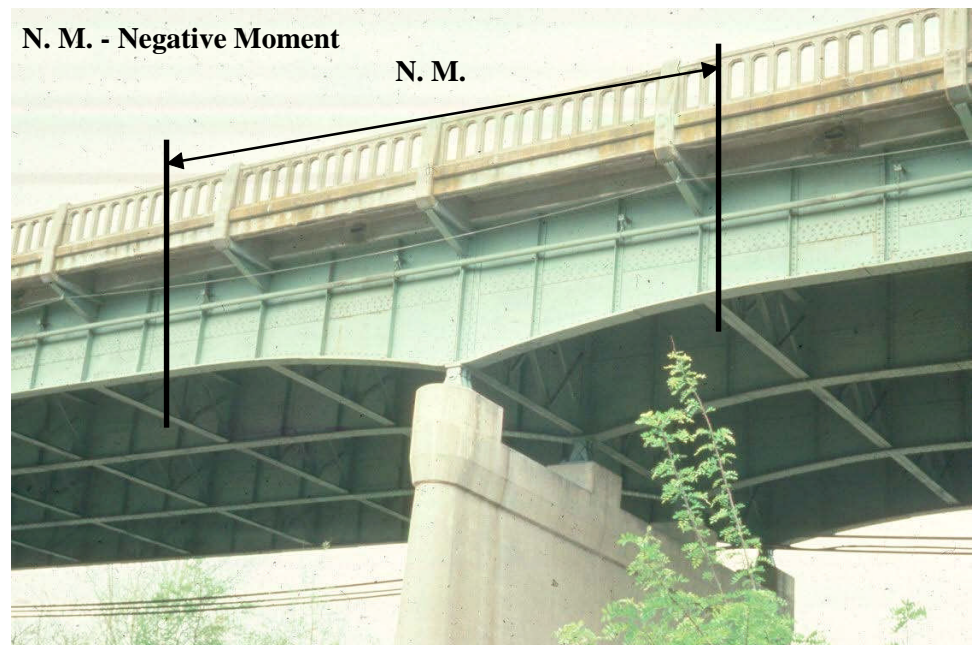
Negative Moment Region on a Continuous Span Fabricated Multi-Girder Bridge
